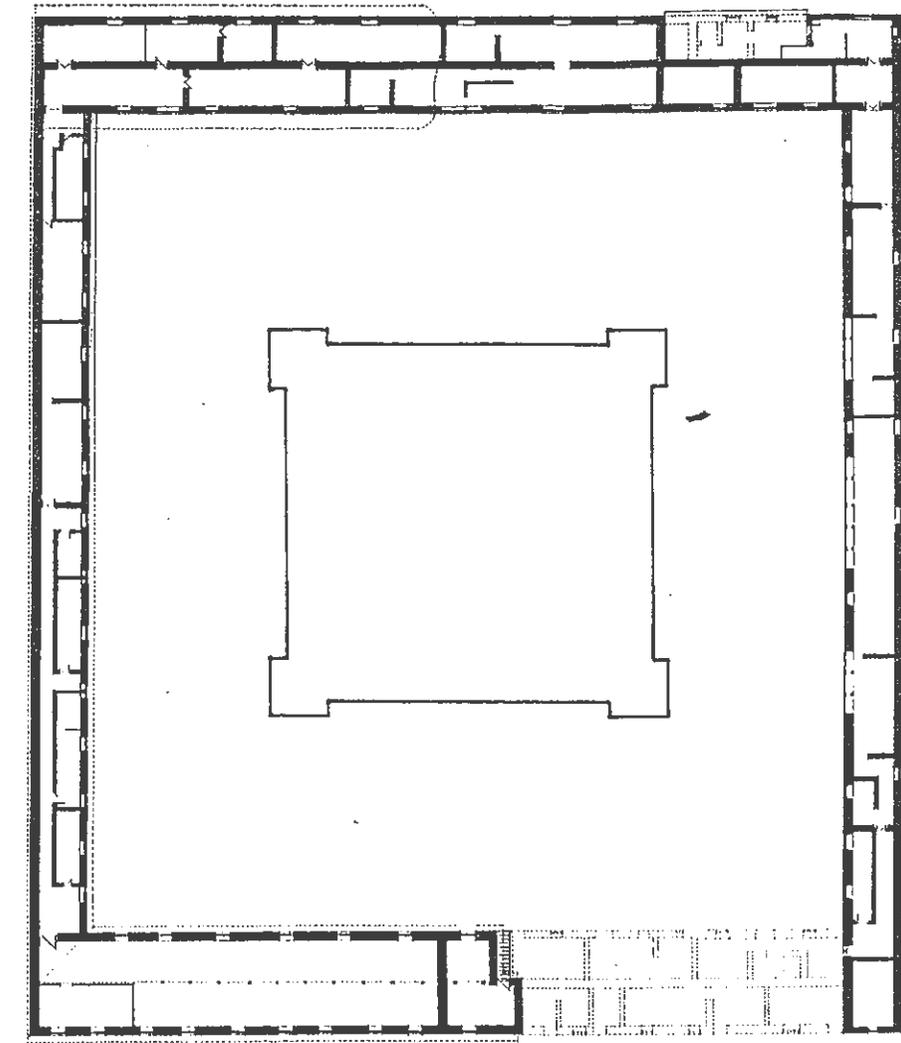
Existing First Floor Plan; much of this level is at present unusable, due to roof damage, lack of space and instability of the structure.
